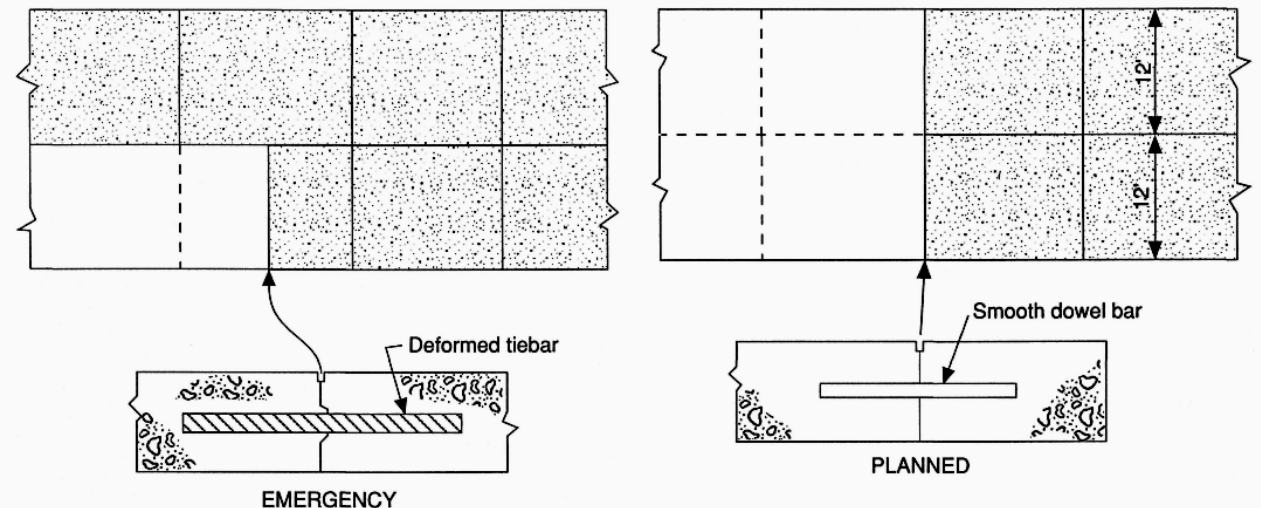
Planned and emergency construction joints for lane-at-a-time paving
